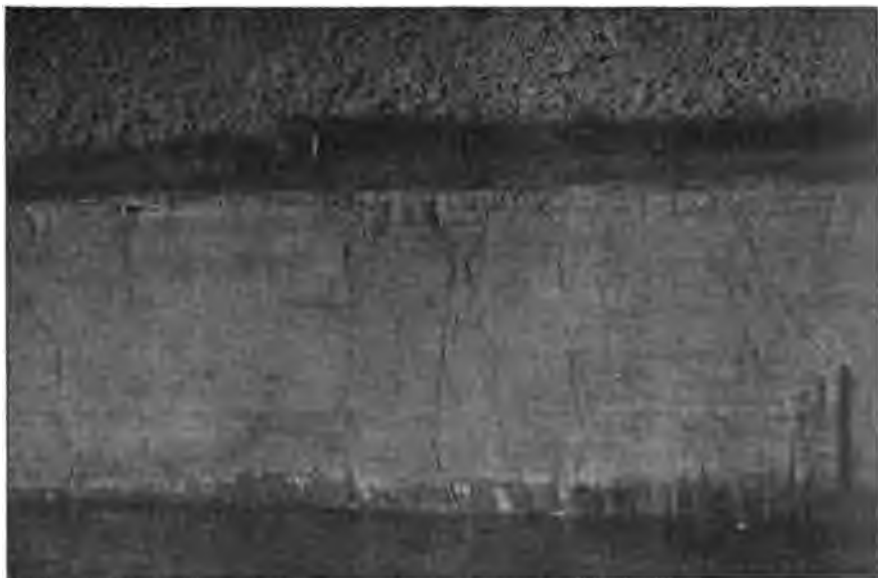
Showing upturned ledges at fissures. Station 1340, Section 12, Chicago Drainage Canal.
